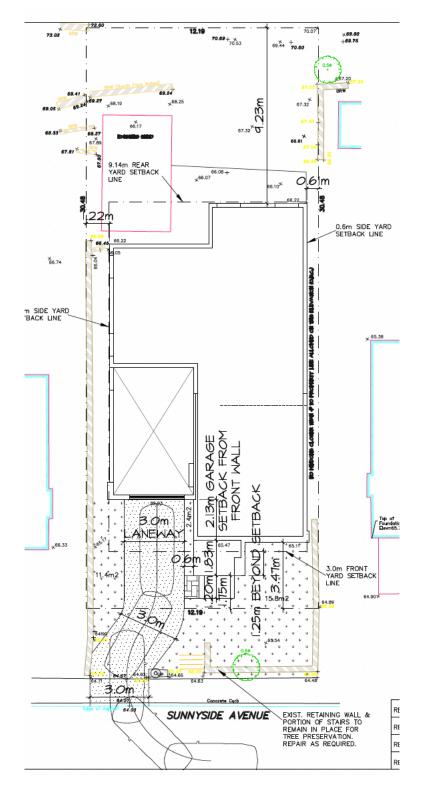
Site Plan, prepared by David Bekkers M.A.A.T.O
